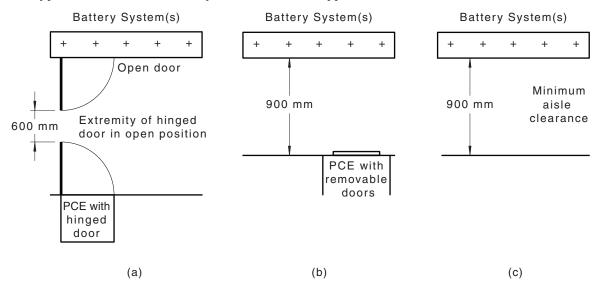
Minimum aisle width requirements for systems greater than DVC-A
